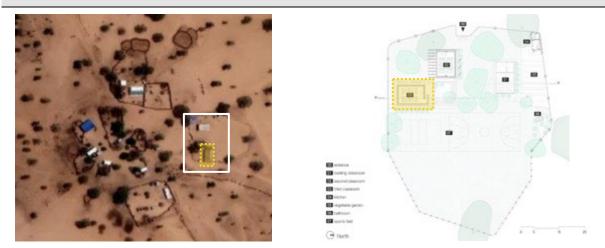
(a) Aerial view and (b). ground plan of the Mbakadou primary school. (source: Google Earth and ASF Italia)
